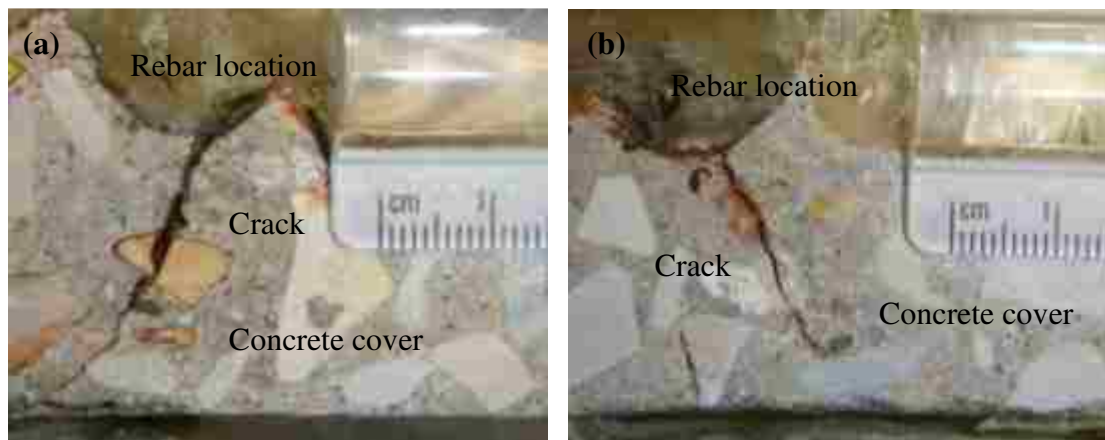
Cracks underneath concrete covers: (a) hairline crack on concrete surface, and (b) no crack on concrete surface.
